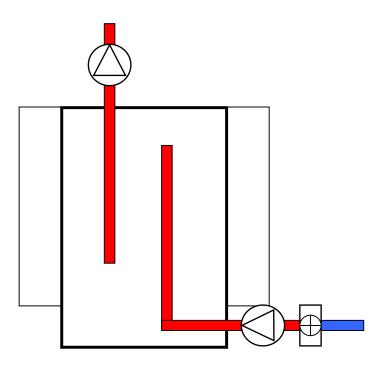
High-rise building with supply and exhaust ventilation before renovation.
